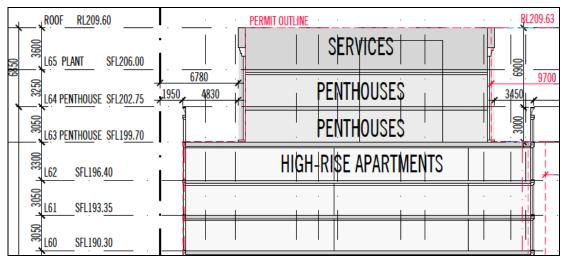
Proposed Section showing the use of the top 20 metres of the tower
